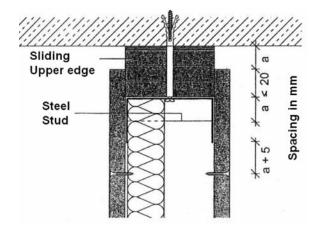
Sliding ceiling connection of a nonstructural wall with fire protection requirements
